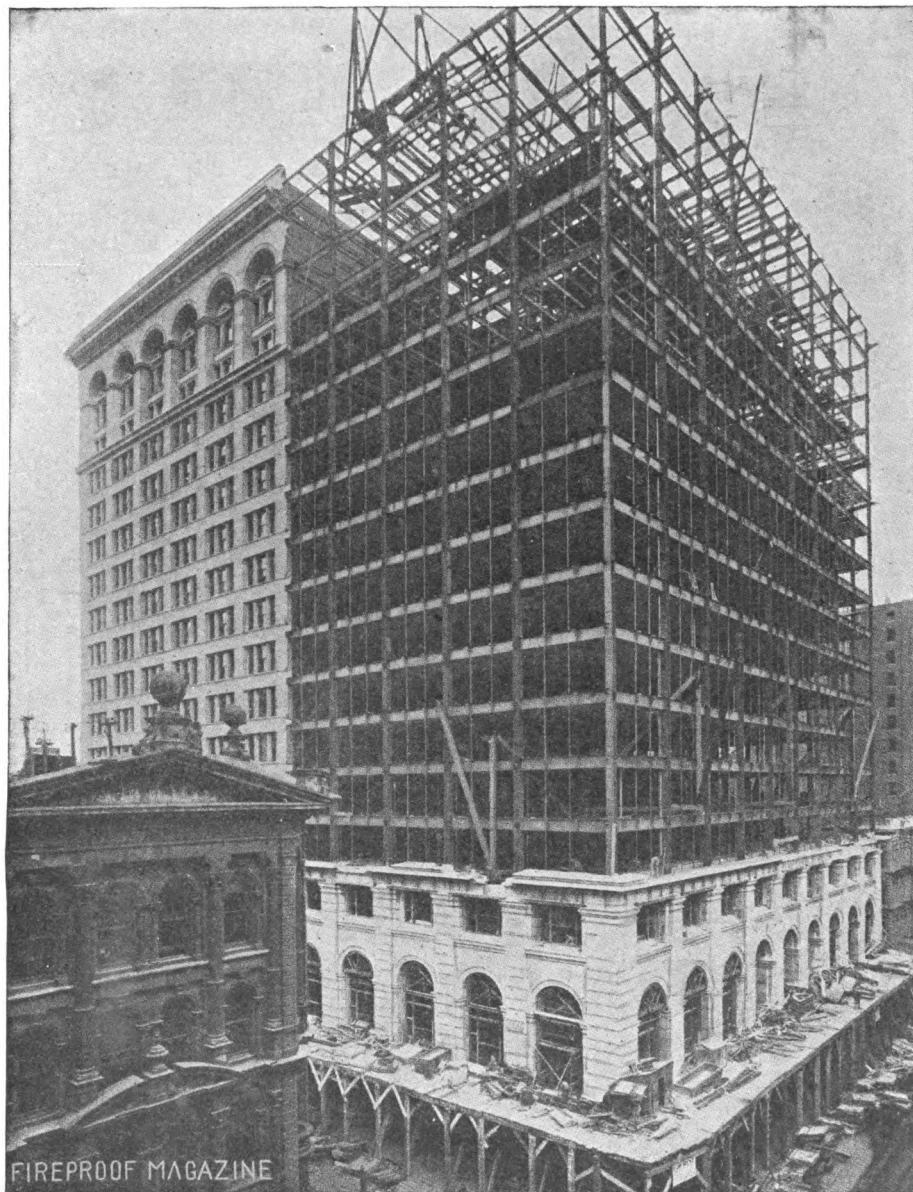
Putting up One of the Great Steel Framed Monsters of Chicago, the First National Bank
